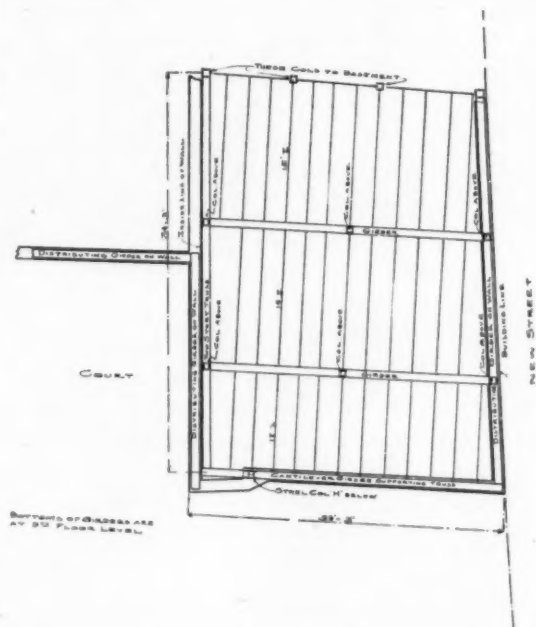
Framing of the old Standard Oil Building at the ninth floor, showing the area on the 9th to 15th floors, inclusive, carried by Column H
